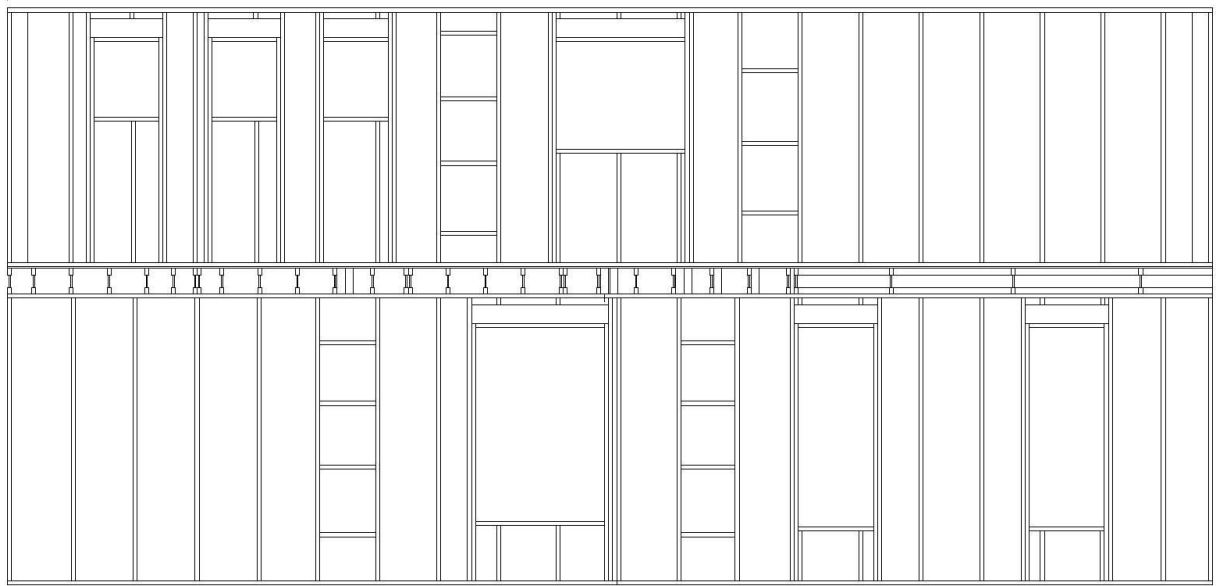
The DH- west wall with a proposed advanced framing system.
